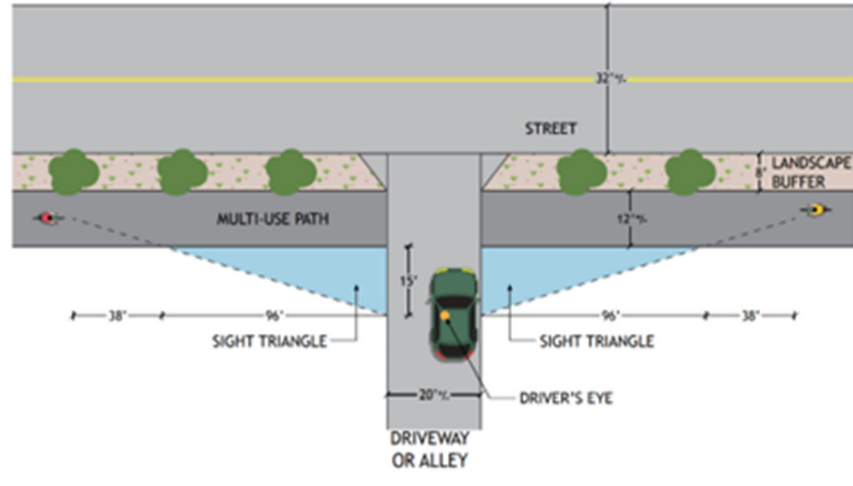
Sight Triangle Area at the intersection of a Driveway or Alley and a Street with a multi-use path
